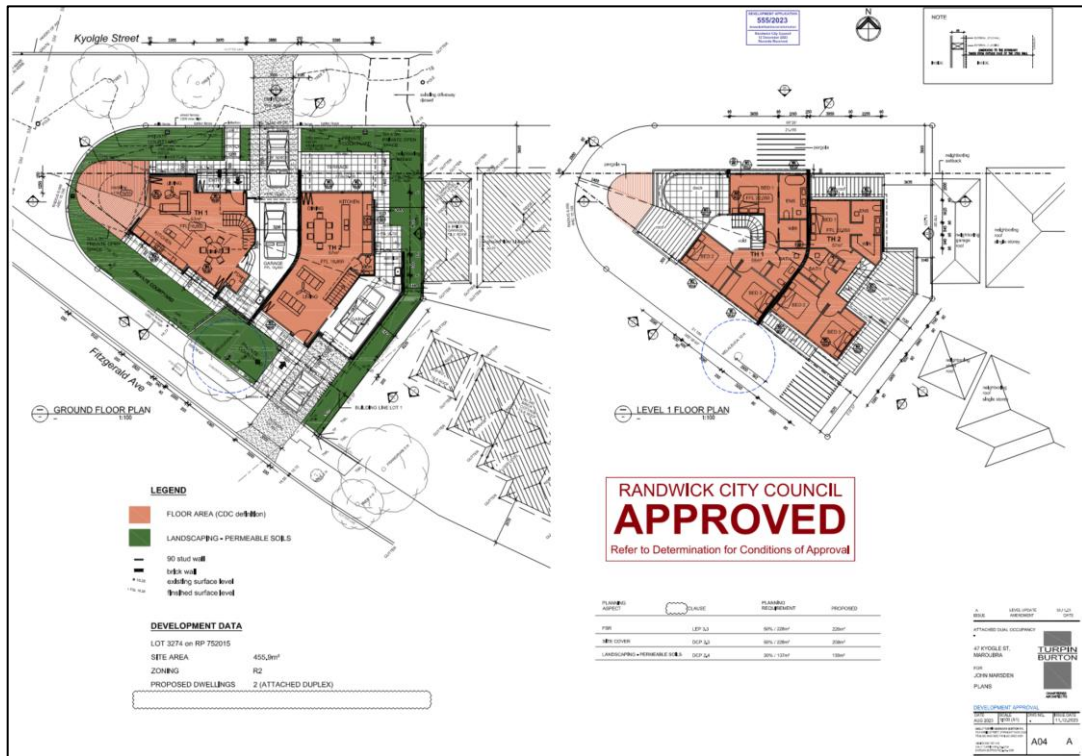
Approved Ground Floor and First Floor Plans for 47 Kyogle Street (Source: DA/555/2023)
